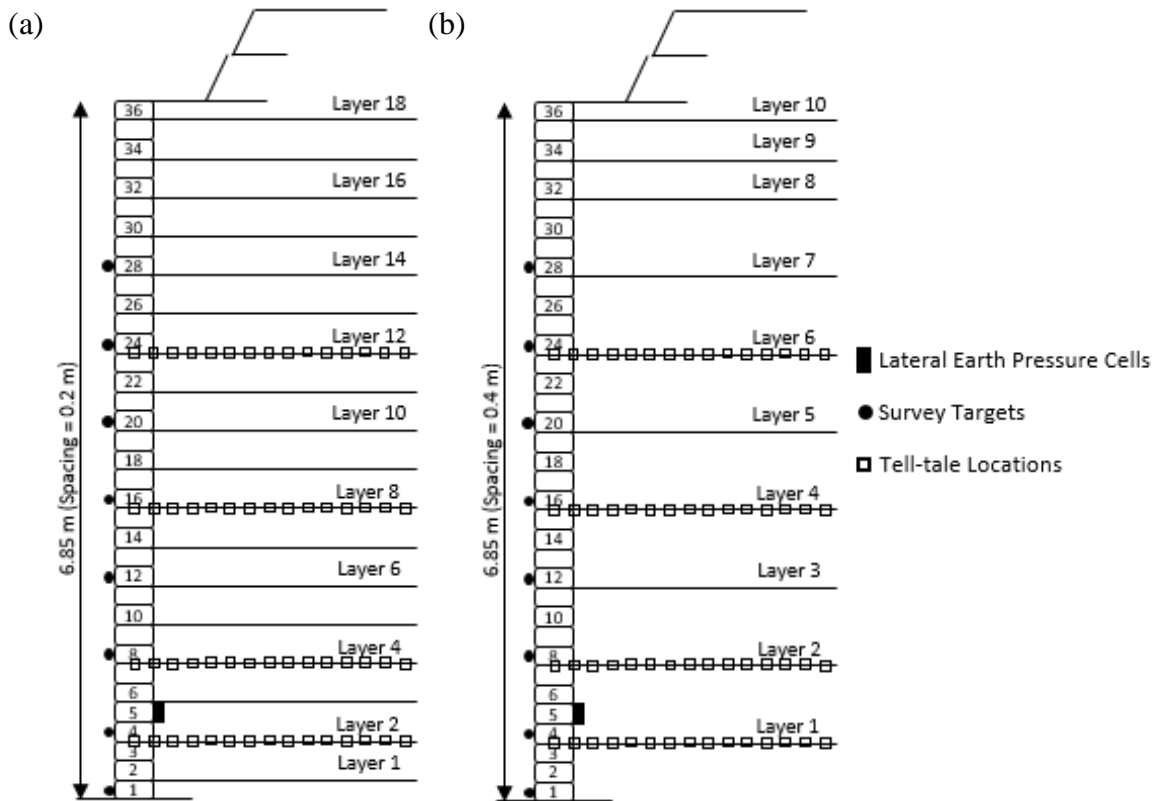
Instrumented cross-sections of the GRS walls: (a) WALL 1; and (b) WALL 2
